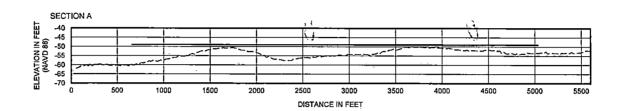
BEACH CROSS-SECTIONS SOUTH PONTE VEDRA BEACH RESTORATION ST. JOHNS COUNTY, FLORIDA
